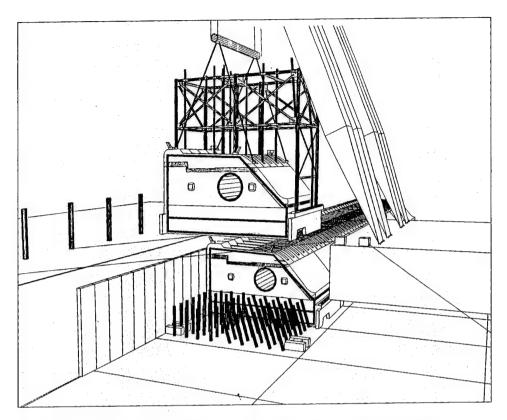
Concept for underwater installation of precast sill shells, Olmsted Dam (from Berner and Ghio 1994)
